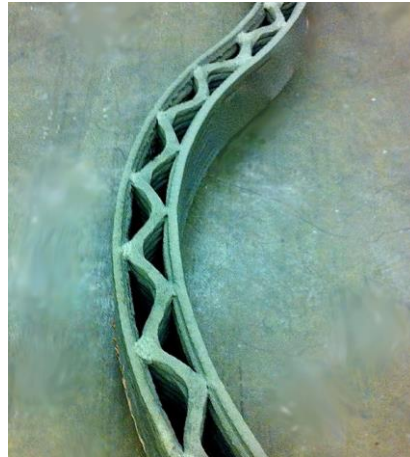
printed concrete infill, constructed by Contour Crafting technique [23]
